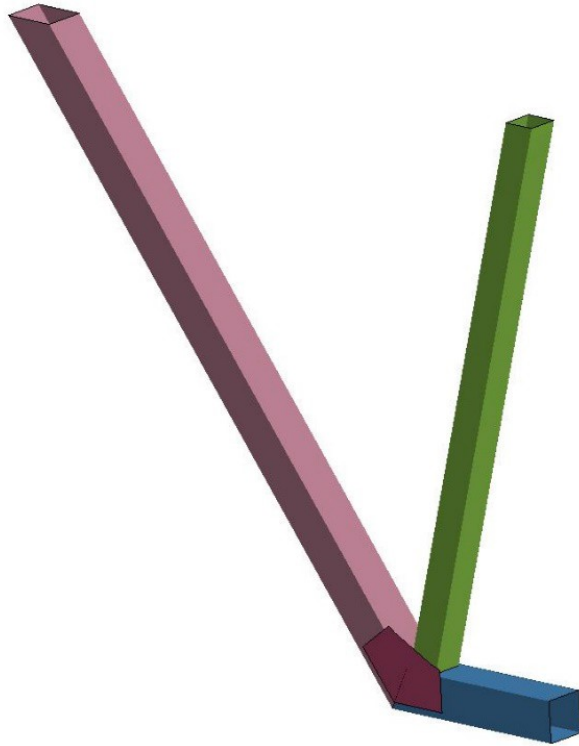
Tubular steel brace design with side gusset plate stiffener
